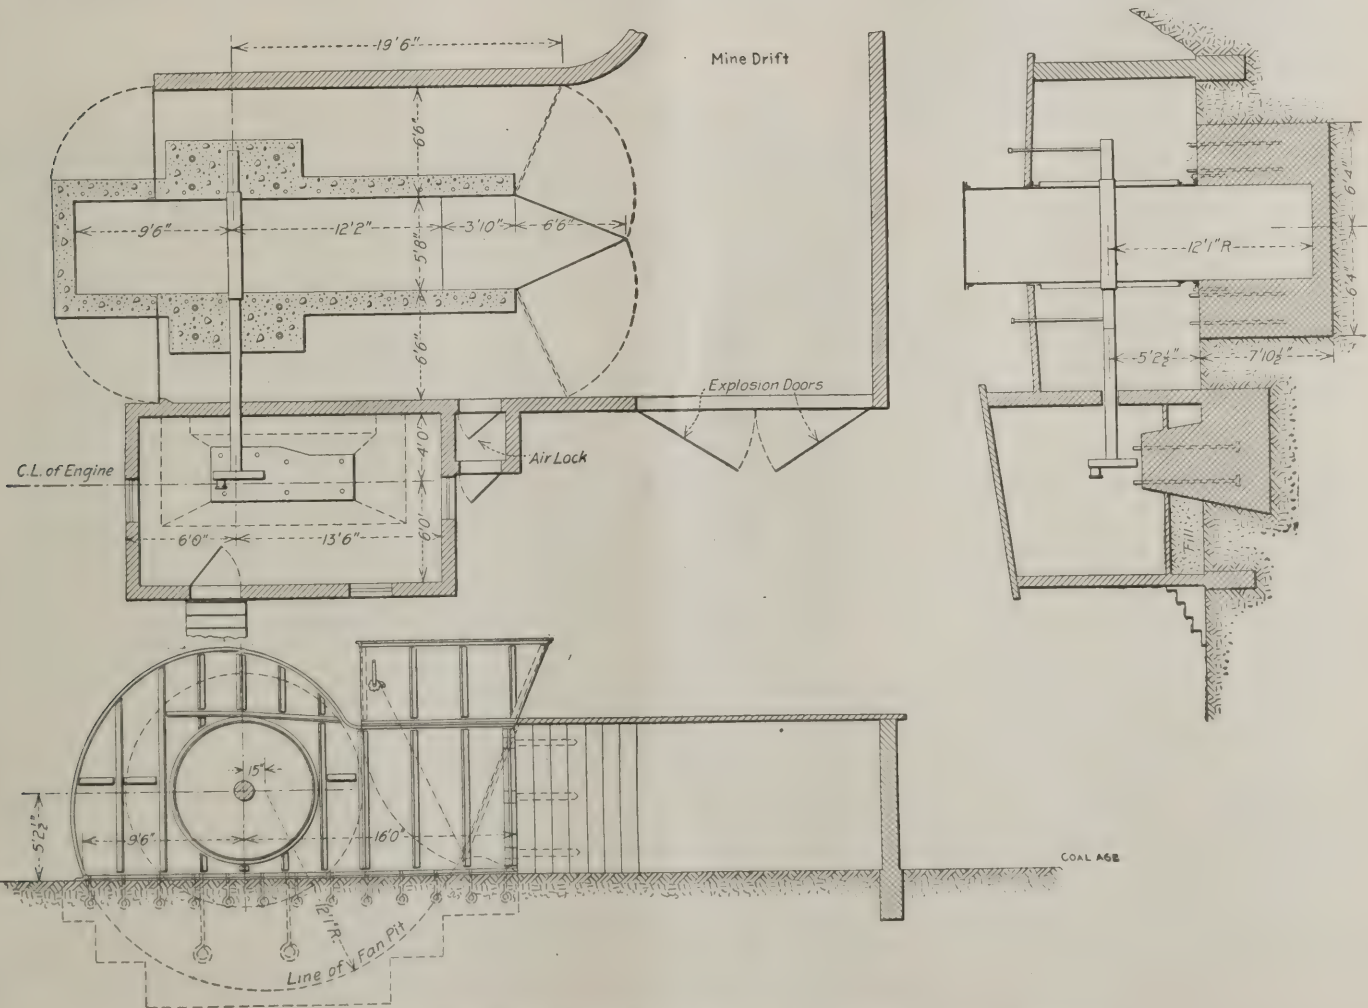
PLAN AND ELEVATIONS OF JEFFREY DOUBLE-INLET TYPE "D" FAN
